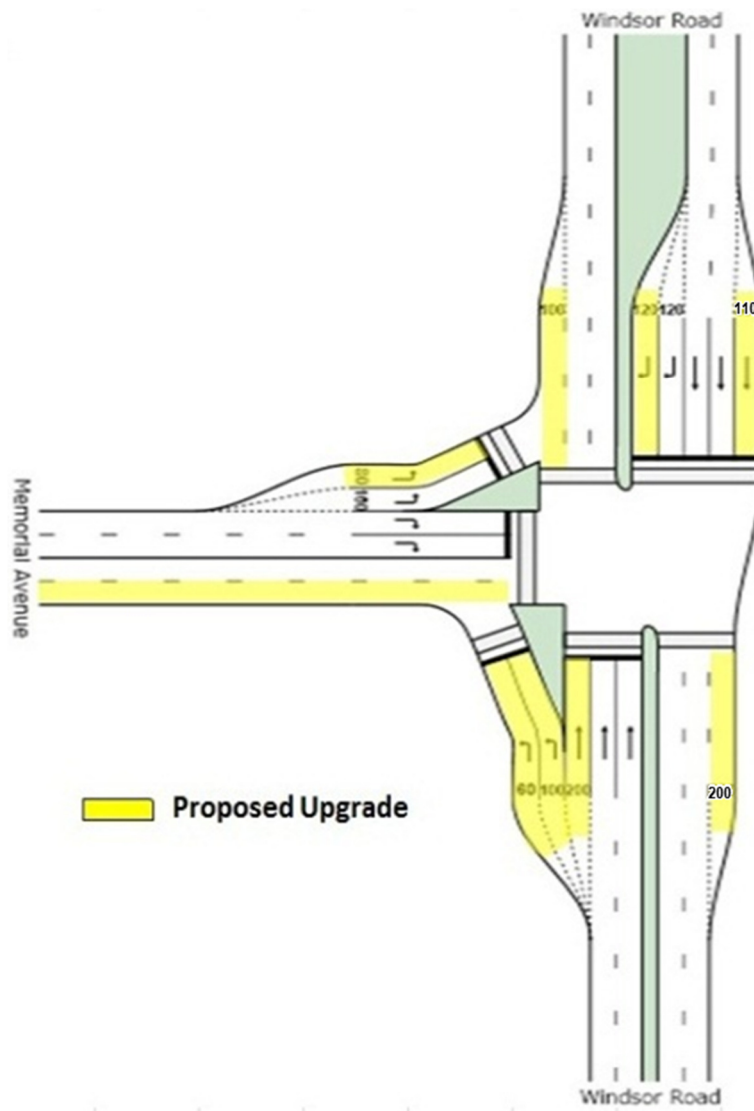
Proposed Layout of Windsor Road and Memorial Avenue Intersection
